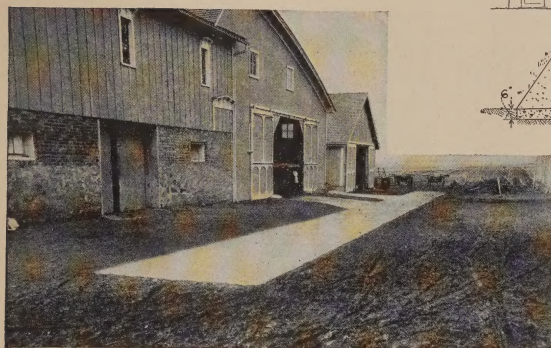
Above: Section of concrete driveway showing crowned surface to shed the water.
